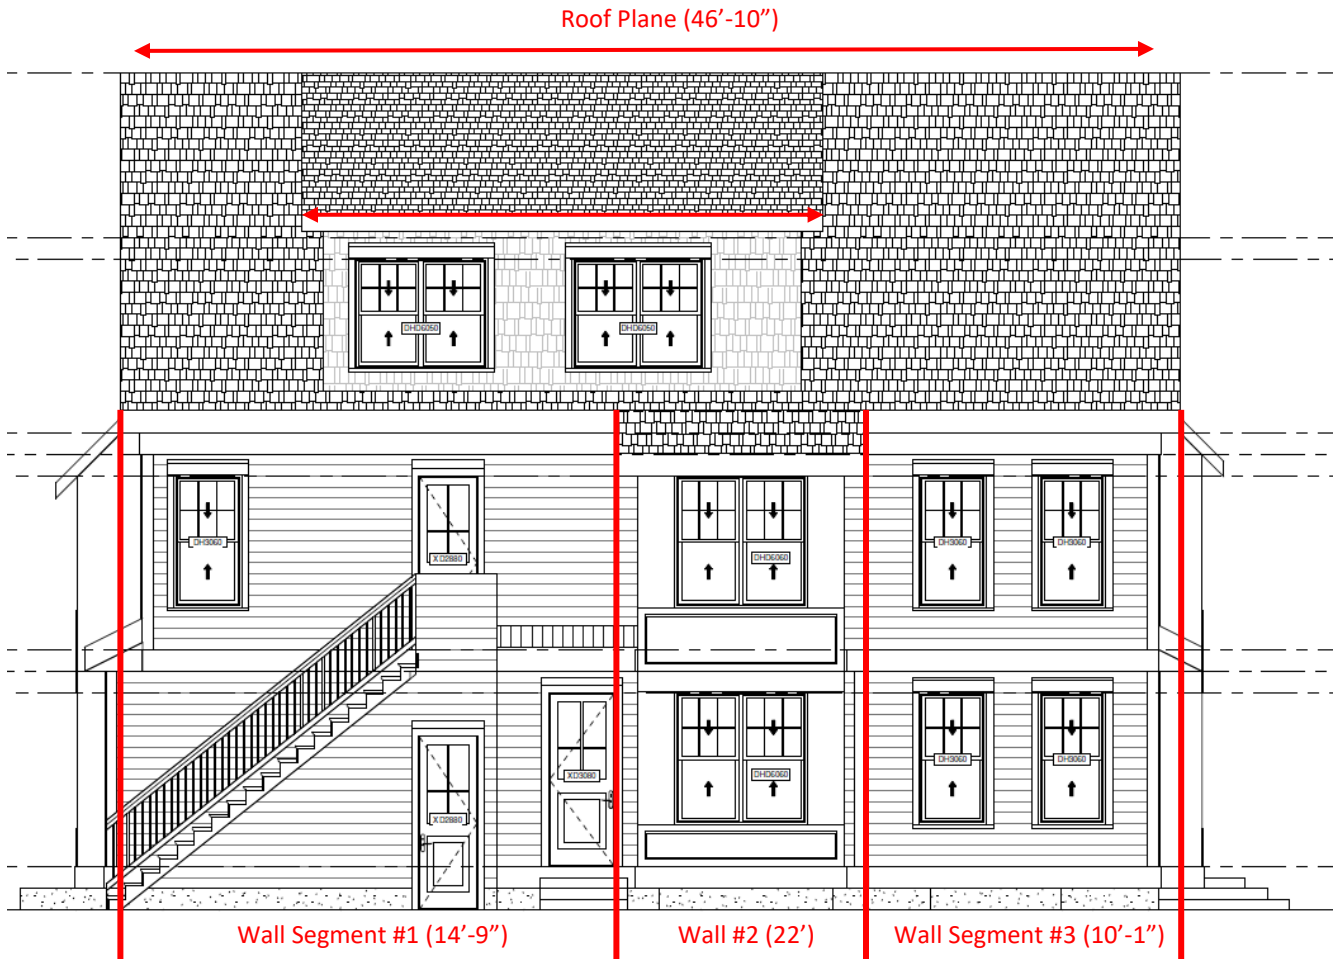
A proposed building elevation with a dormer that exceeds 50% of the length of the exterior walls of the story beneath, which is calculated as 3 individual segments, based on ISD's current interpretation
